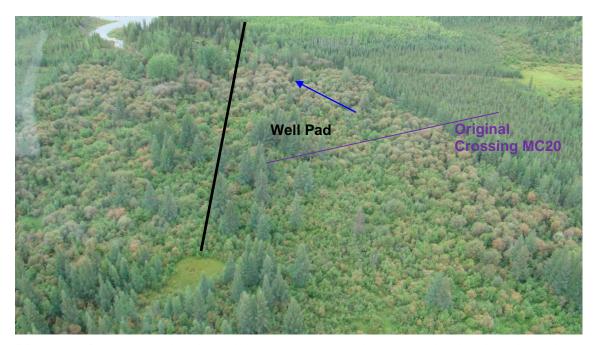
Drainage 1 showing original crossing location and revised well pad location
